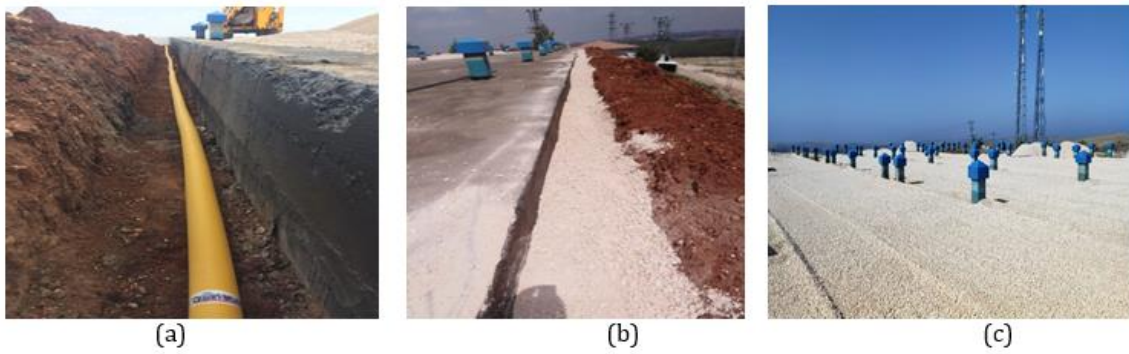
(a) Roof Water Drainage Flooring, (b) Roof Water Drainage Filling, (c) Water Tank Roof Filling Work
